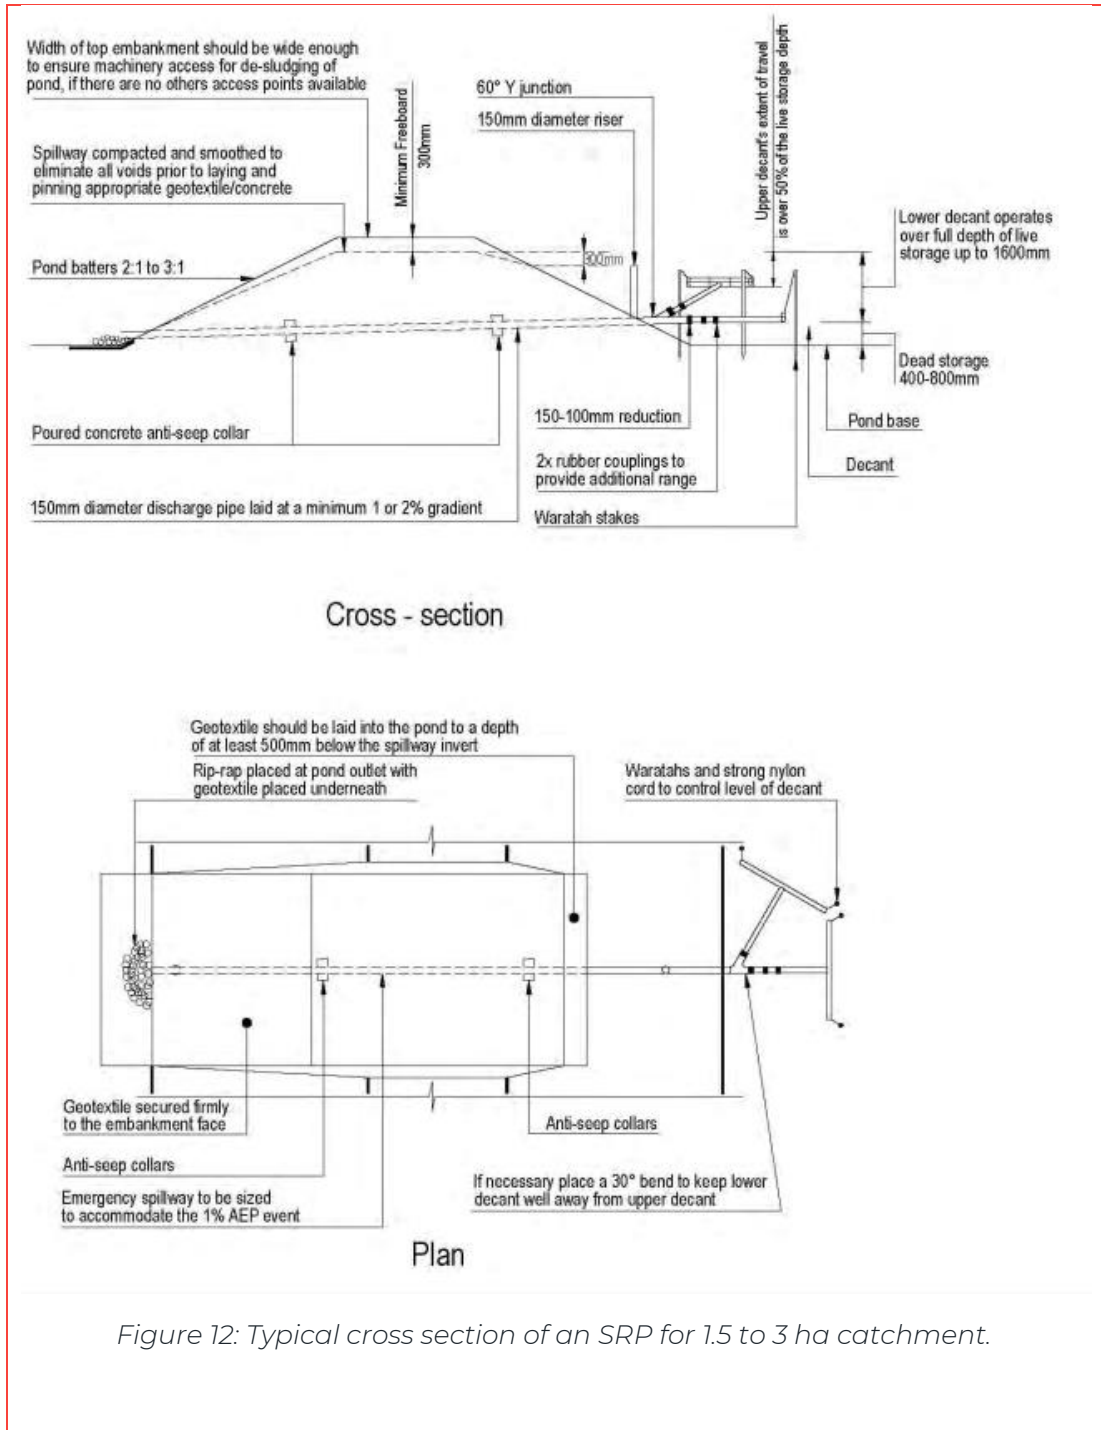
Typical cross section of an SRP for 1.5 to 3 ha catchment.
